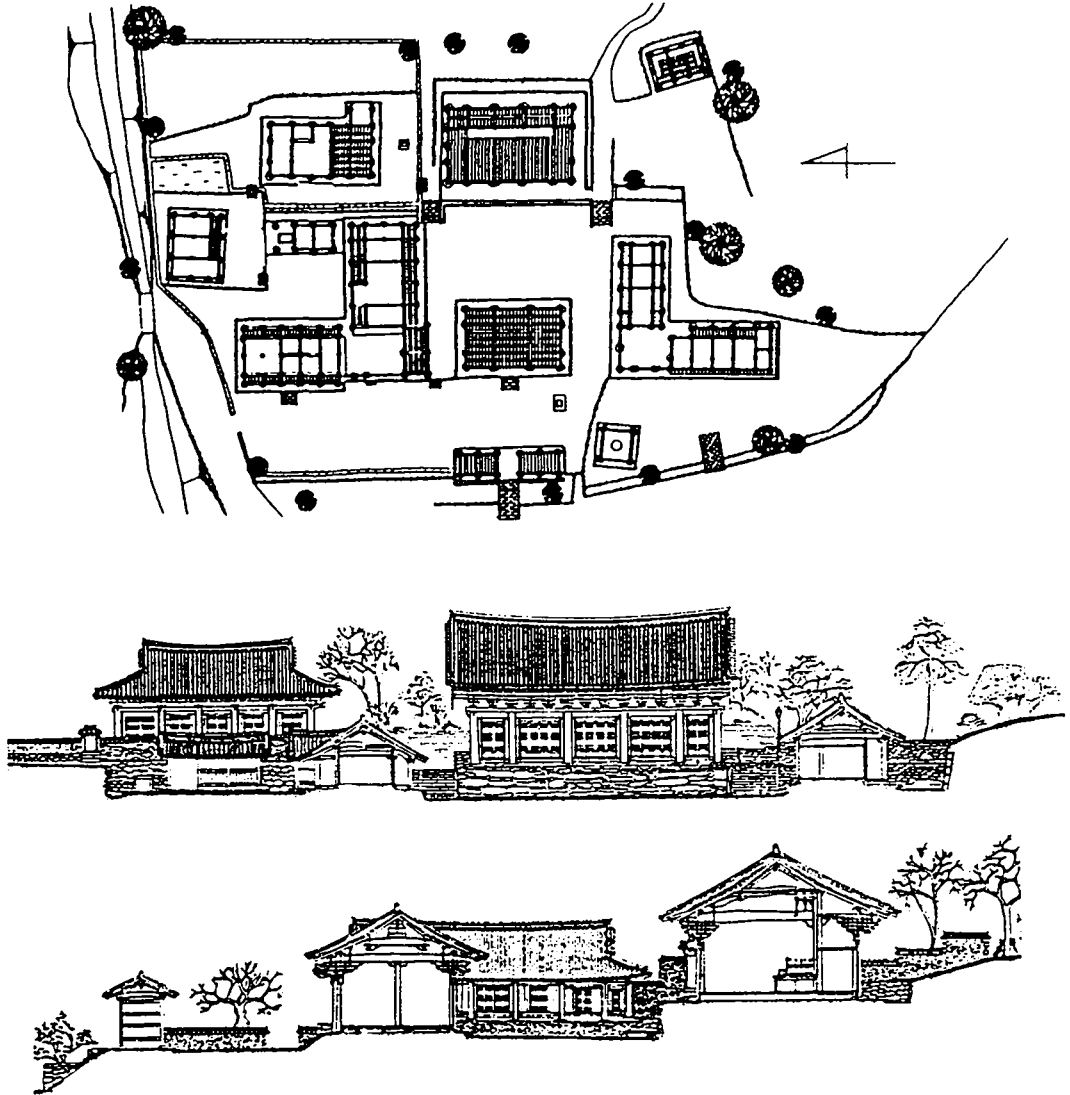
Kab-sa 甲寺 갑사: ground plan (scale: 1 : 1,000) and two sections (scale: 1 : 500)
